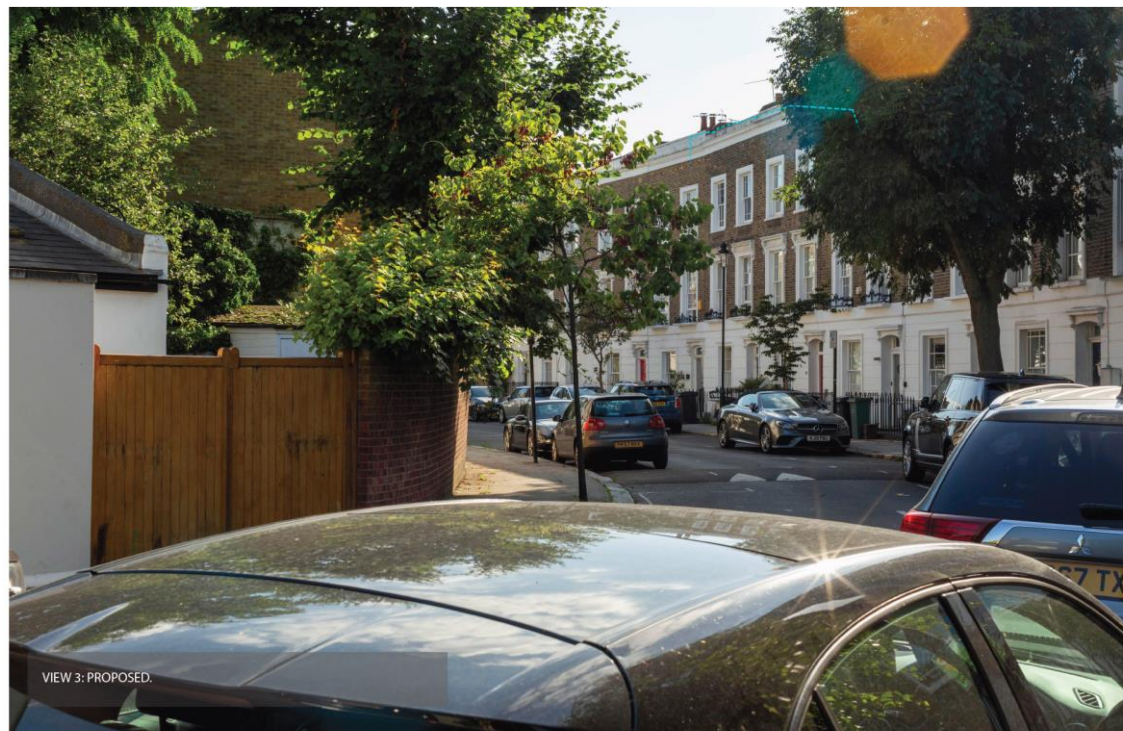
View 3 - Proposed roofscape outlined in blue. As you can see the proposal will not be visible from the streetscape due to the design and topography of the road.
